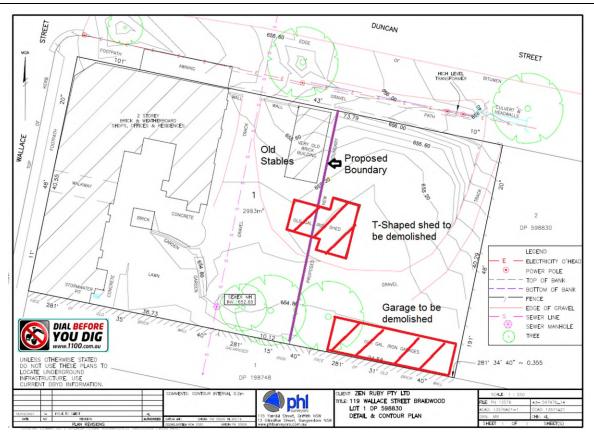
Survey Plan showing proposed subdivision boundary (purple) and existing buildings to be demolished (red)
